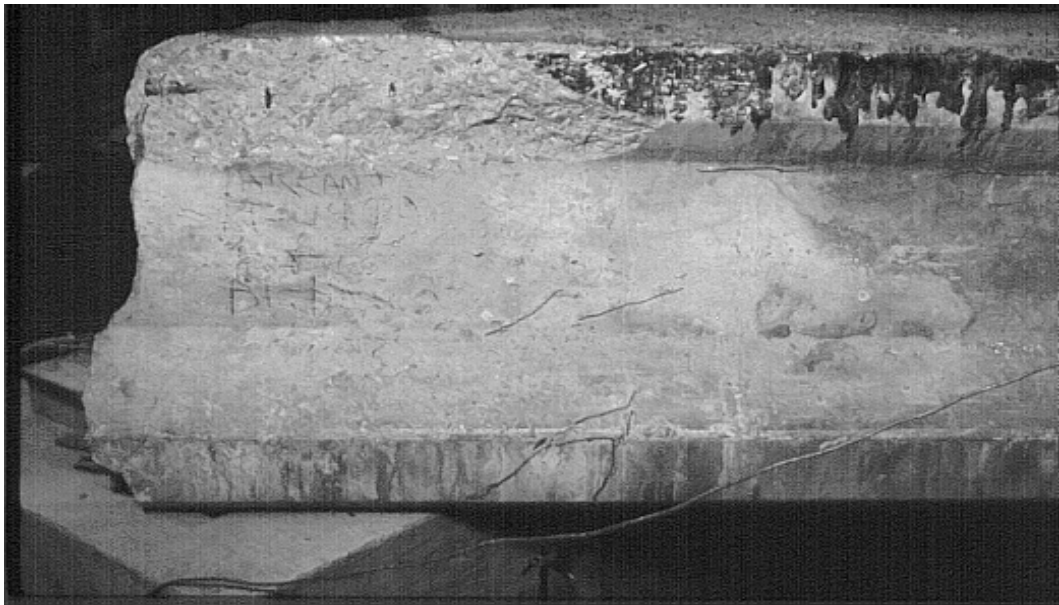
Pretest Cracking of East Face of Box Beam 3 - Test 1
